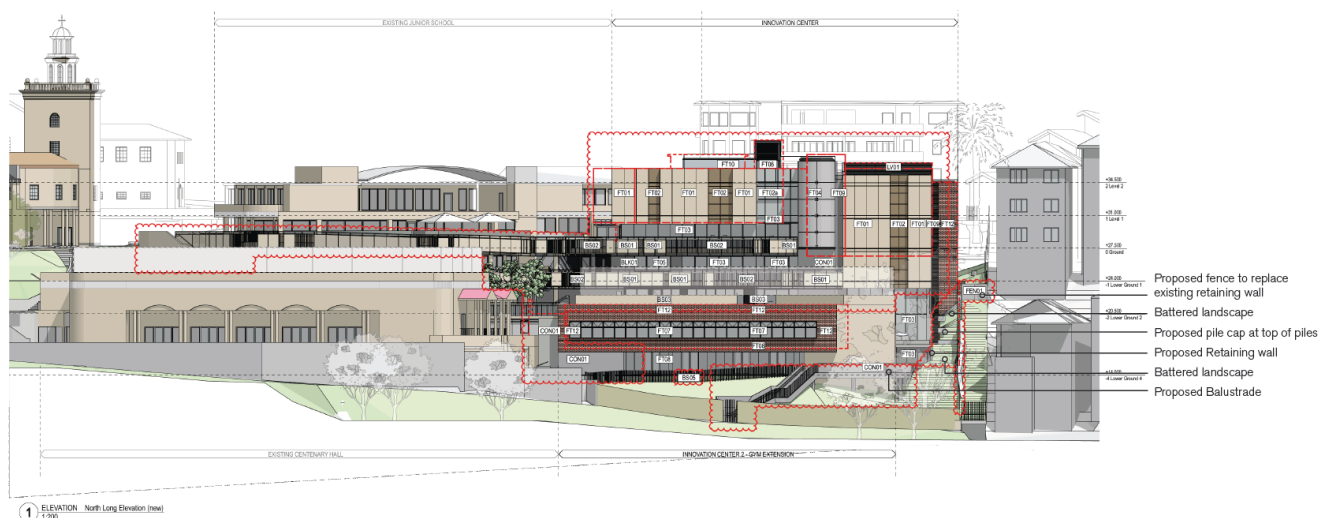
DA 3002 (Northern Elevation) explanatory diagram
